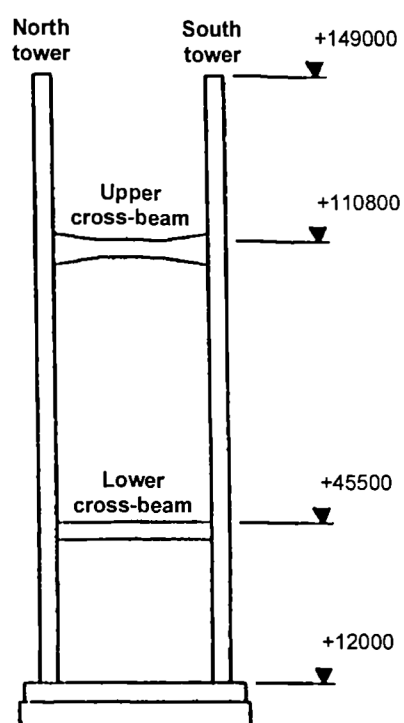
(a) Second Severn Crossing cable-stayed bridge:
